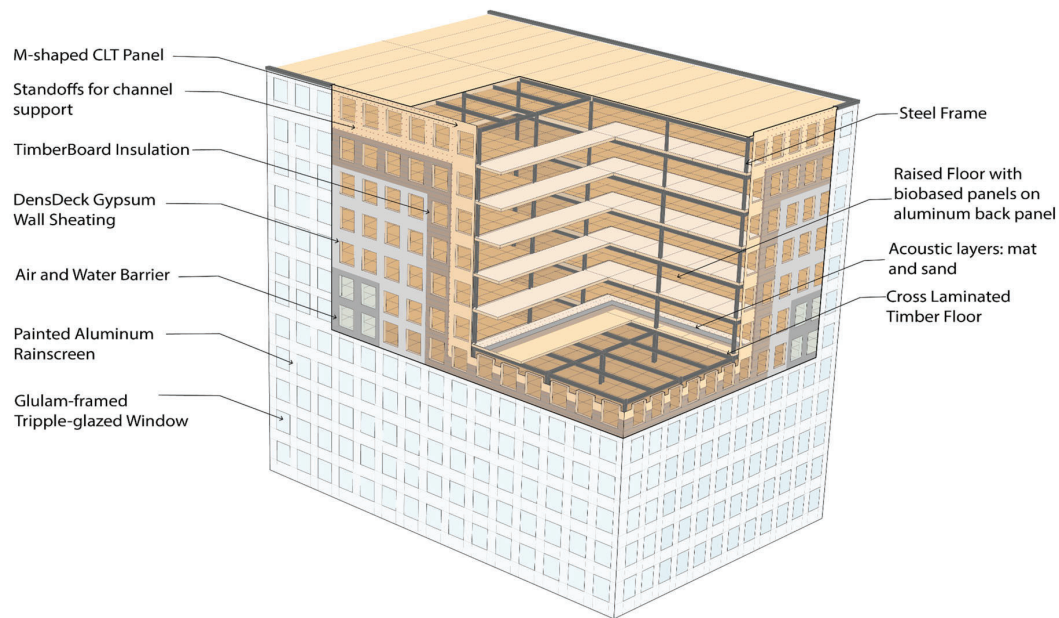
Typical Prototype Building for Steel-CLT Structural Systems
